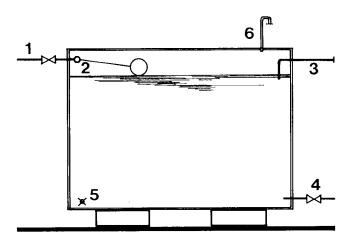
TYPICAL COLD WATER STORAGE TANK, SCHE-MATICAL SECTION
